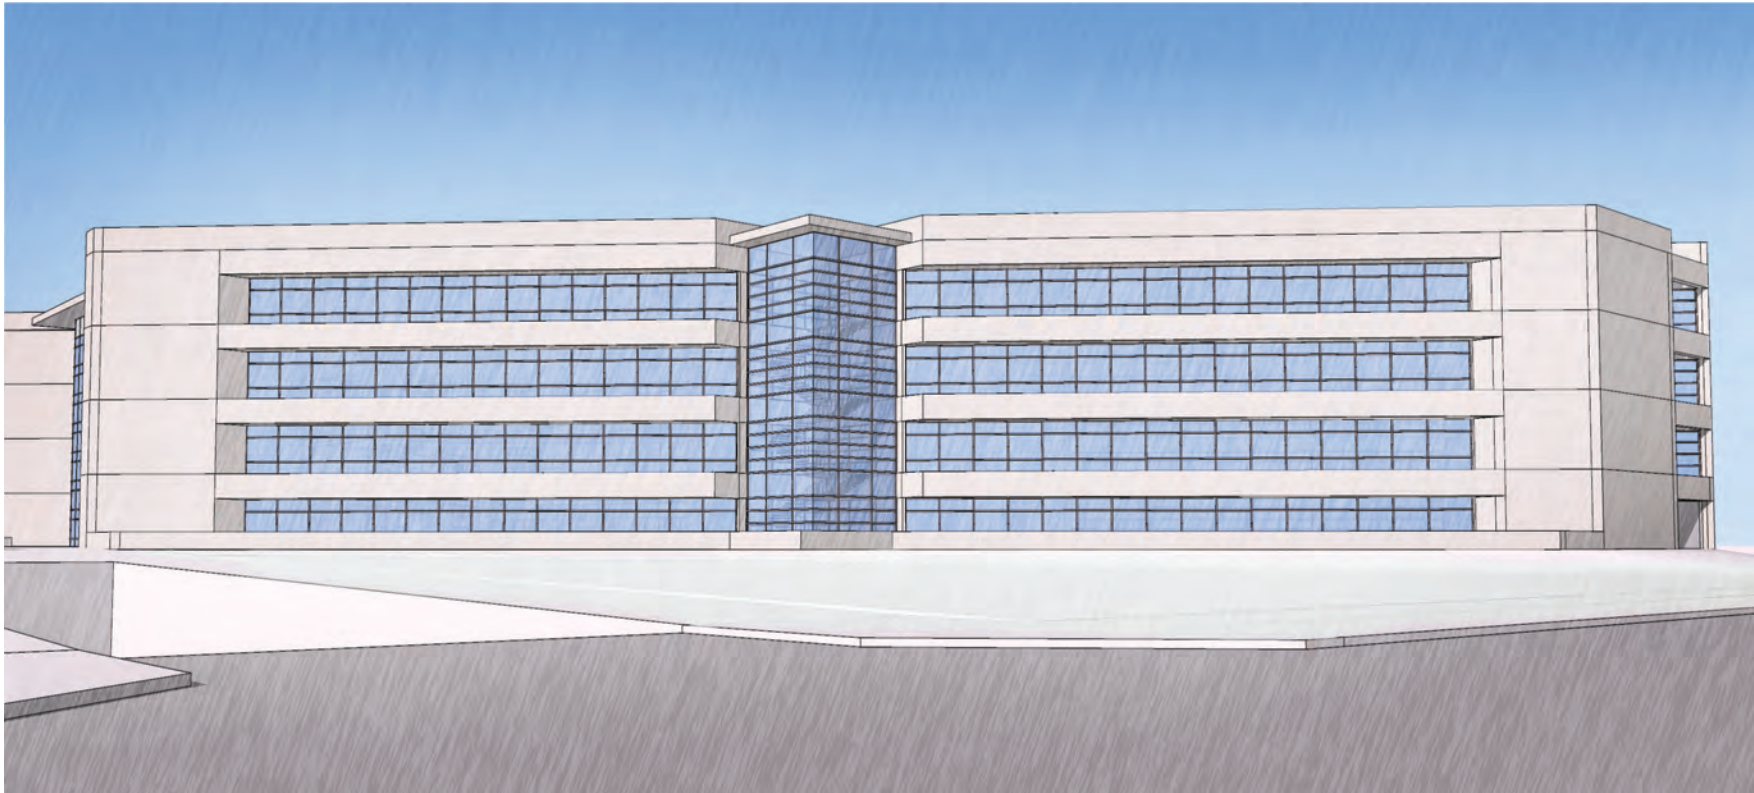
Perspective 1 - Proposed Herschler Building - East Elevation
